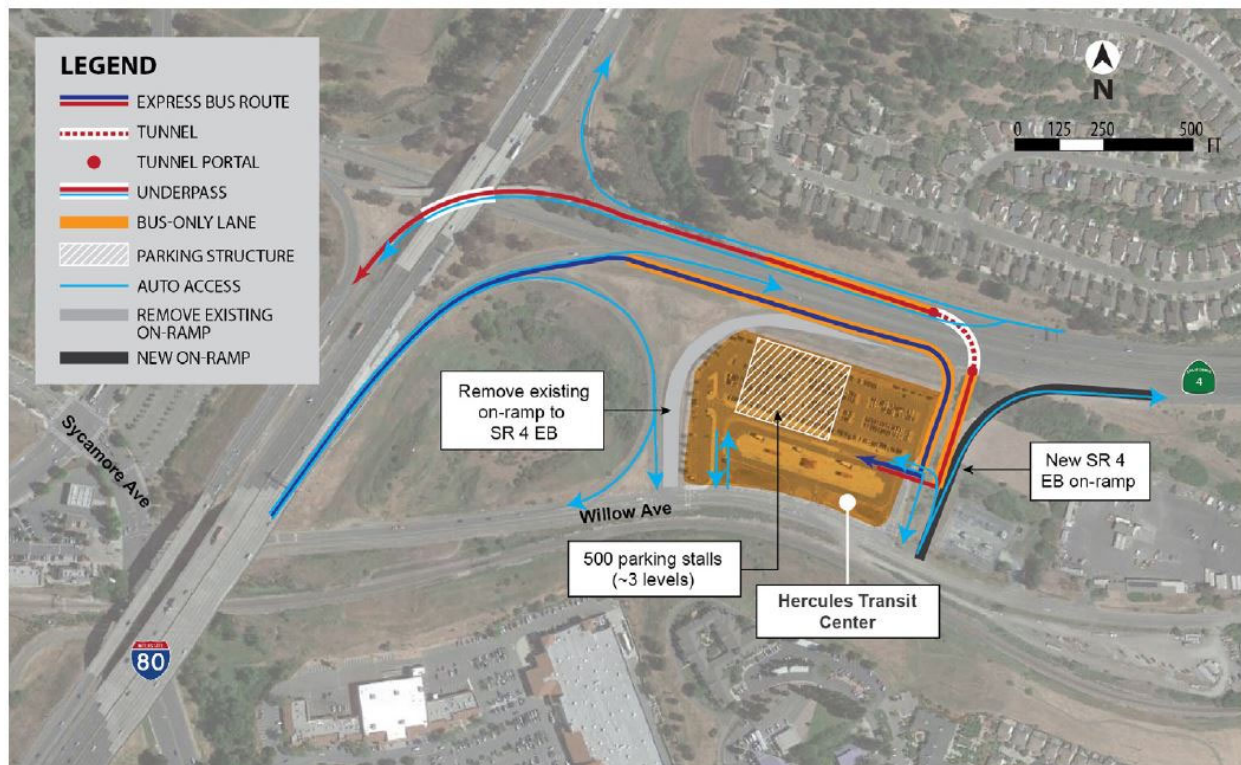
Hercules Transit Center Direct Access Ramps and Underpass
